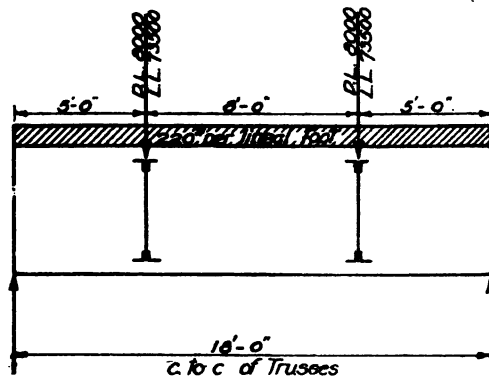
MAXIMUM LOADING ON END FLOOR BEAM
